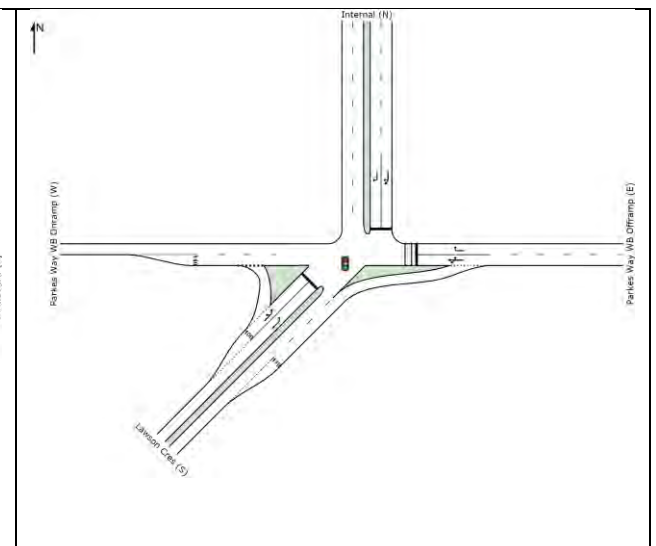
UDS Feasibility Design Parkes Way Boulevard – Lawson Crescent Intersection
